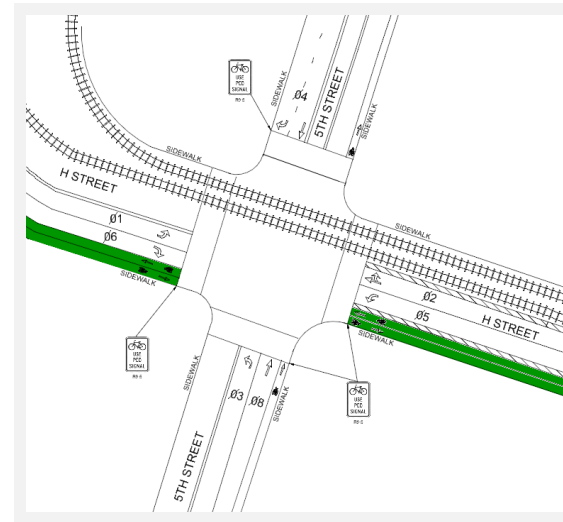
H STREET AT 5TH STREET INTERSECTION LAYOUT
